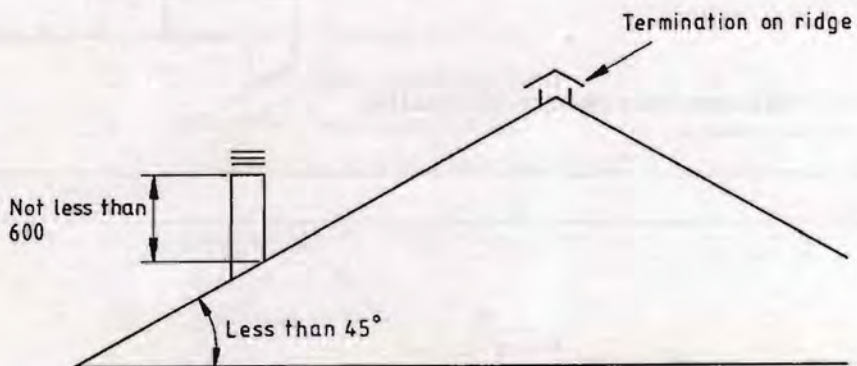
Pitch roof, internal route, pitch not exceeding 45° and ridge termination
